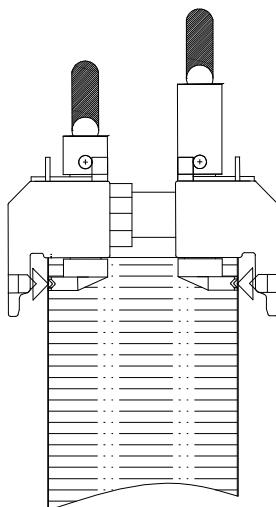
Lifting a split sawn, groove less element in horizontal installation
